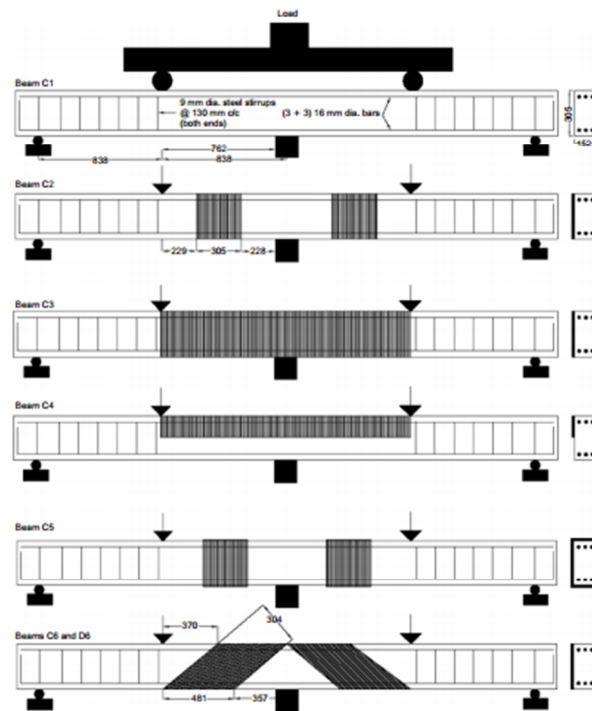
Beam configuration details from shear strengthening with CFRP (Bukhari, Vollum, Ahmad, & Sagaseta, 2010)
